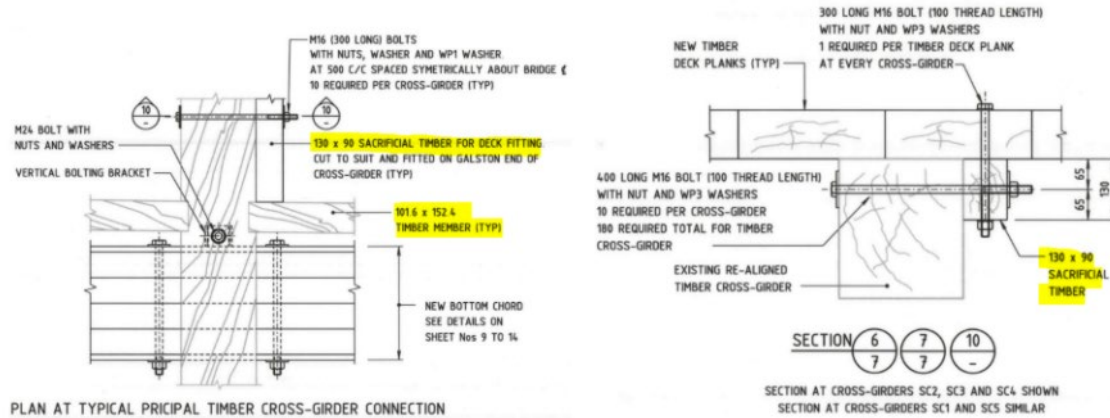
Detail and section showing corbel and timber ties in the bridge. (Source: Design Report and 520212TP-AURC-B00390-ST-DRG-000044, Aurecon 2023)
